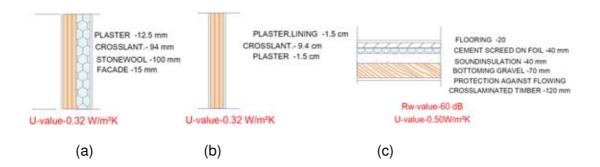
Outer (a), inner (b) wall and floor composition of Building 2
